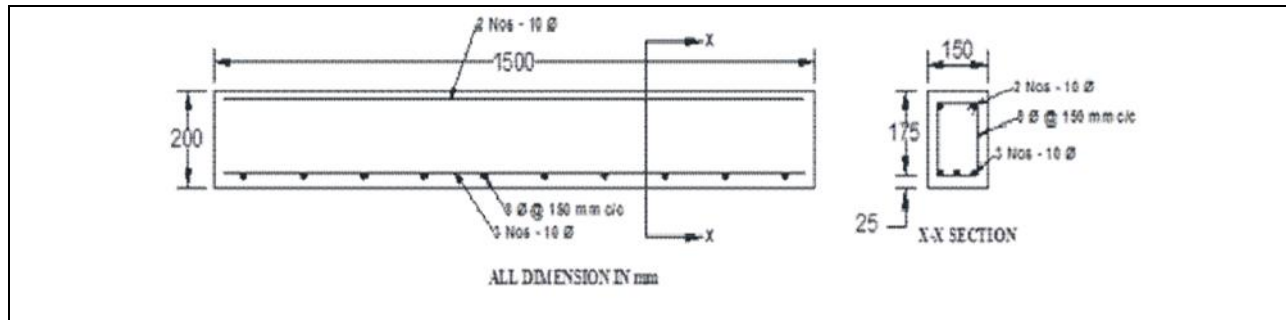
11: The Specimens' Geometry and Reinforcement[24]
